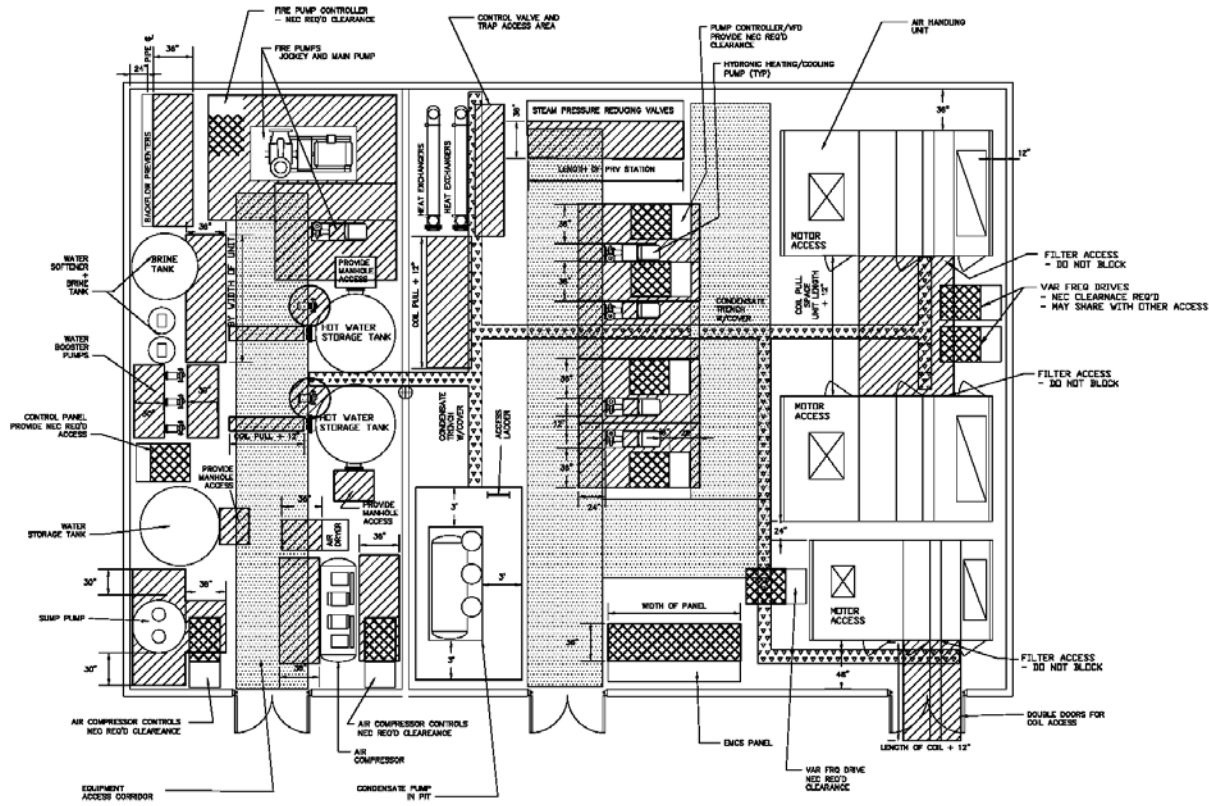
SAMPLE MECHANICAL ROOM LAYOUT
